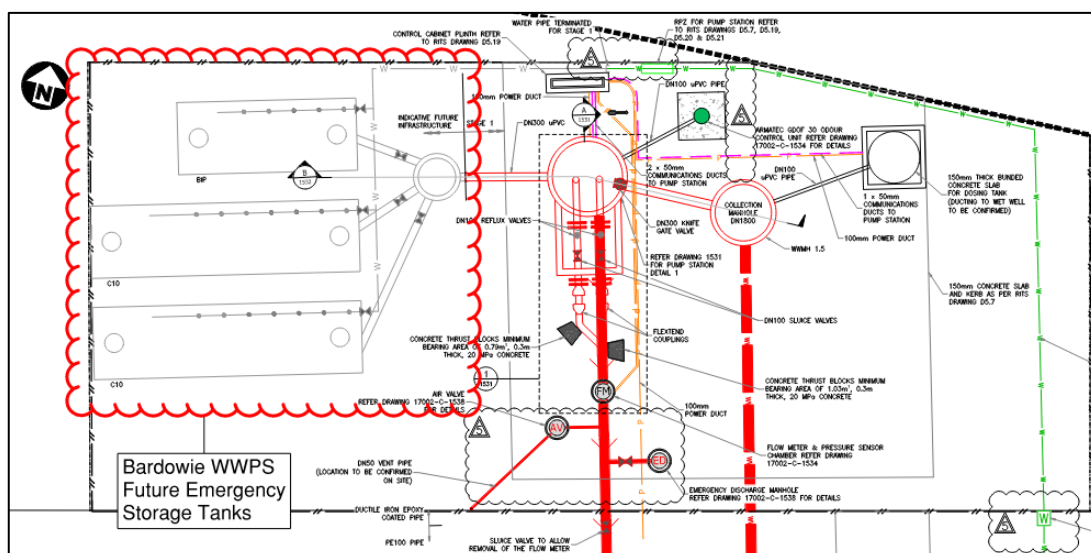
BARDOWIE WASTEWATER PUMPSTATION LAYOUT
